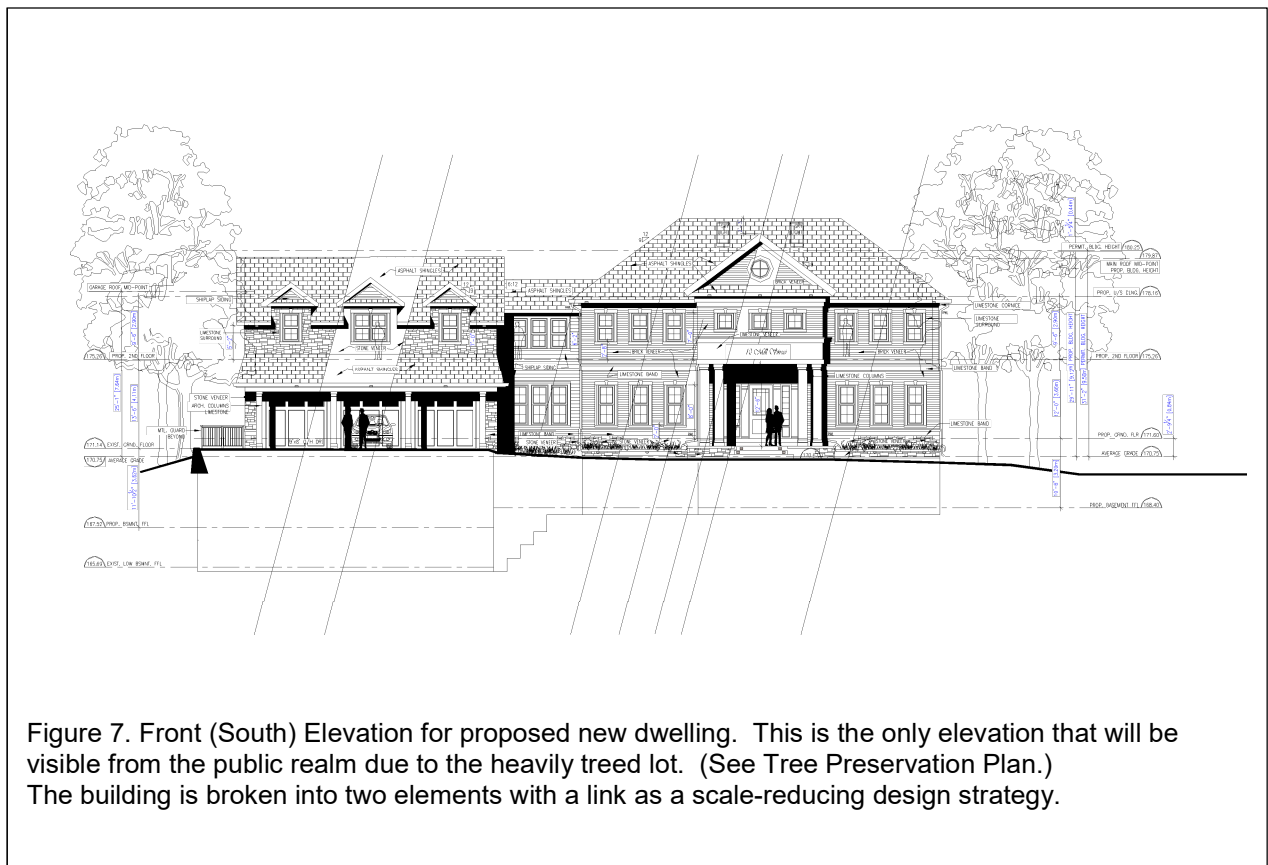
Front (South) Elevation for proposed new dwelling. This is the only elevation that will be visible from the public realm due to the heavily treed lot. (See Tree Preservation Plan.) The building is broken into two elements with a link as a scale-reducing design strategy.
